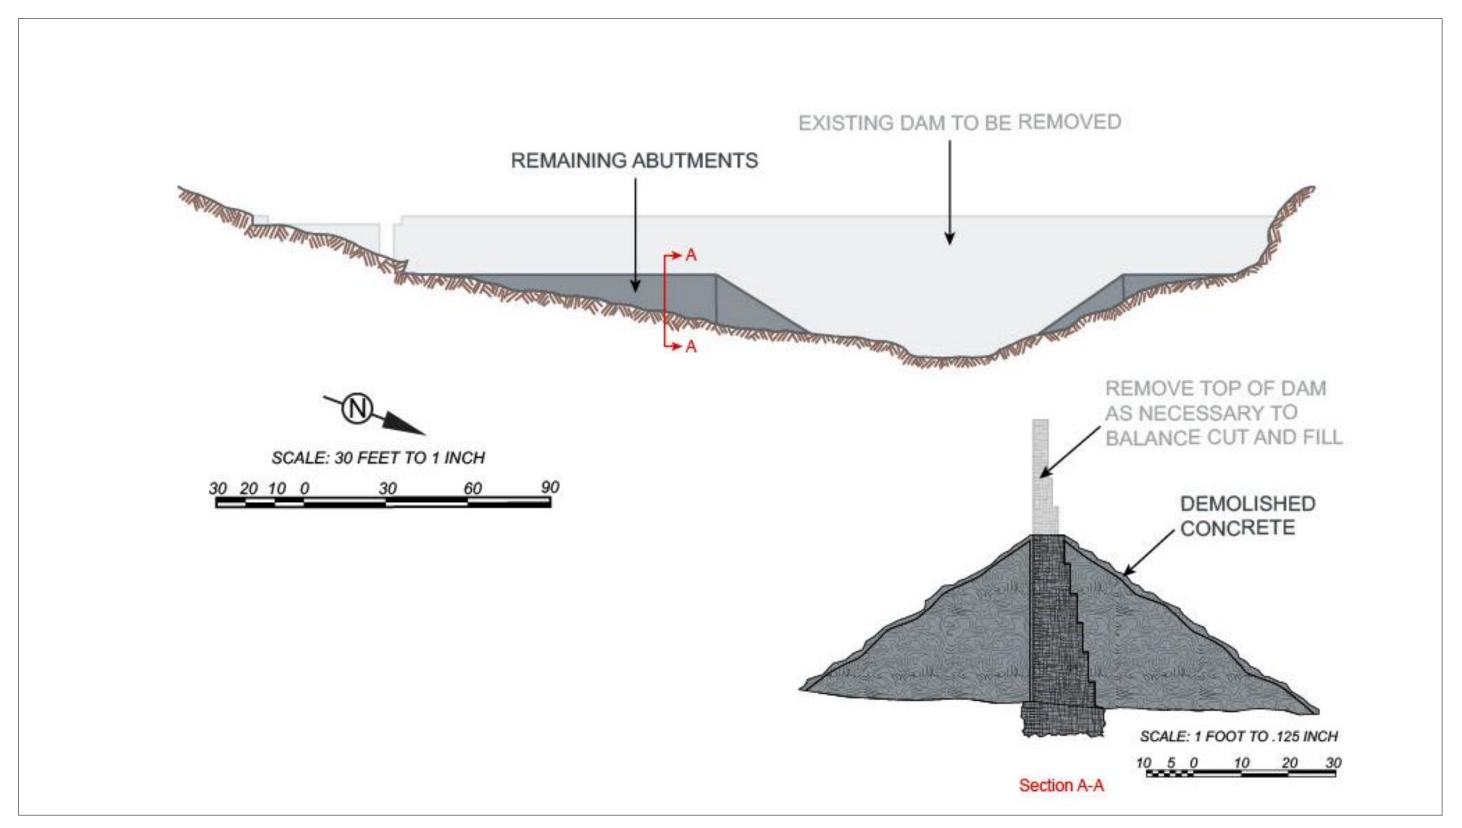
Cross Section of the Existing Rush Meadows Dam and Remaining Abutments Associated with Partial Dam Removal
